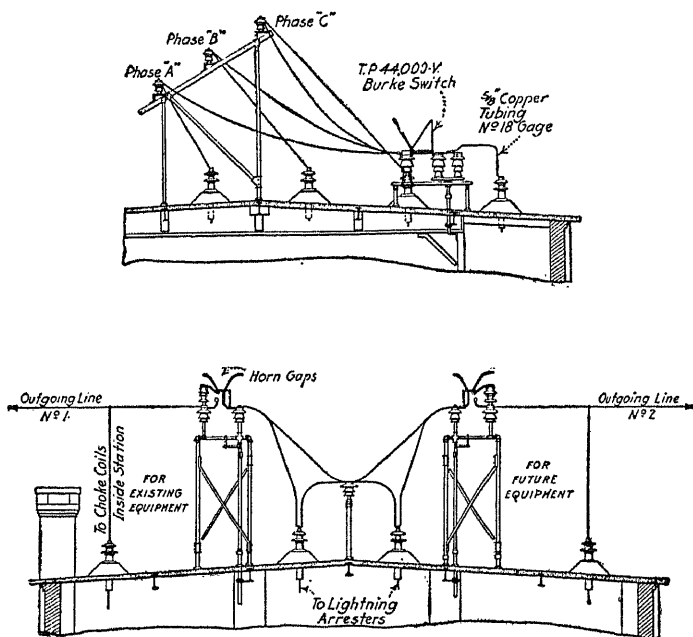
Roof Outlets and Circuits for Outgoing Transmission Lines
